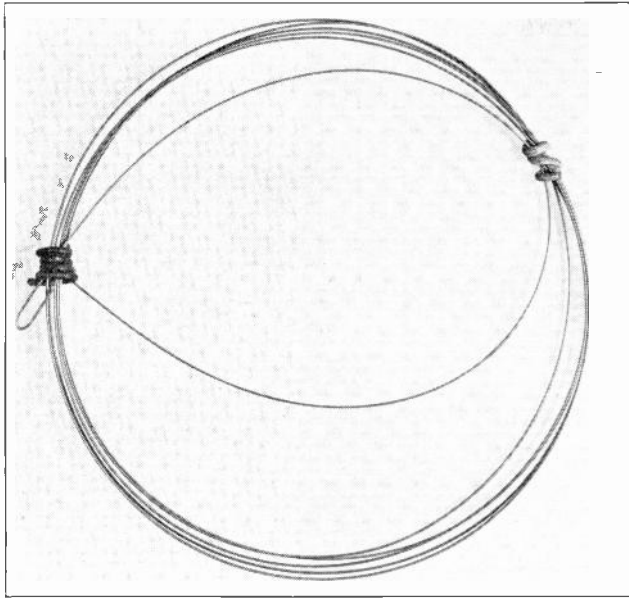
A coil of steel fish tape, such as used for pulling wires into difficult places in a building, or through conduit.
